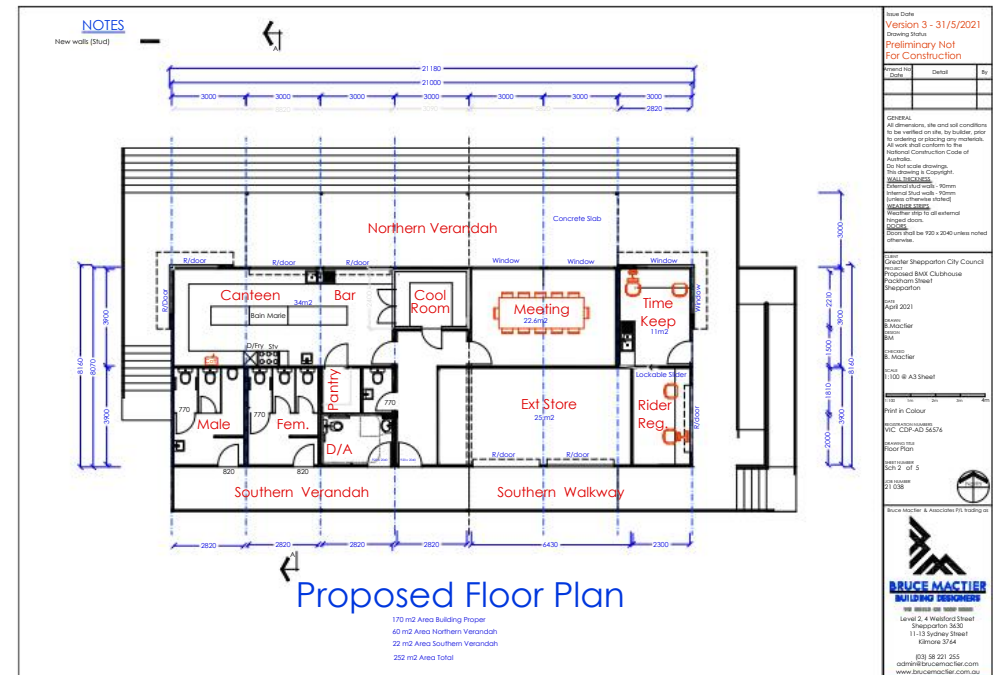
Proposed BMX Pavilion (Adopted from Bruce Mactier Building Designers)
